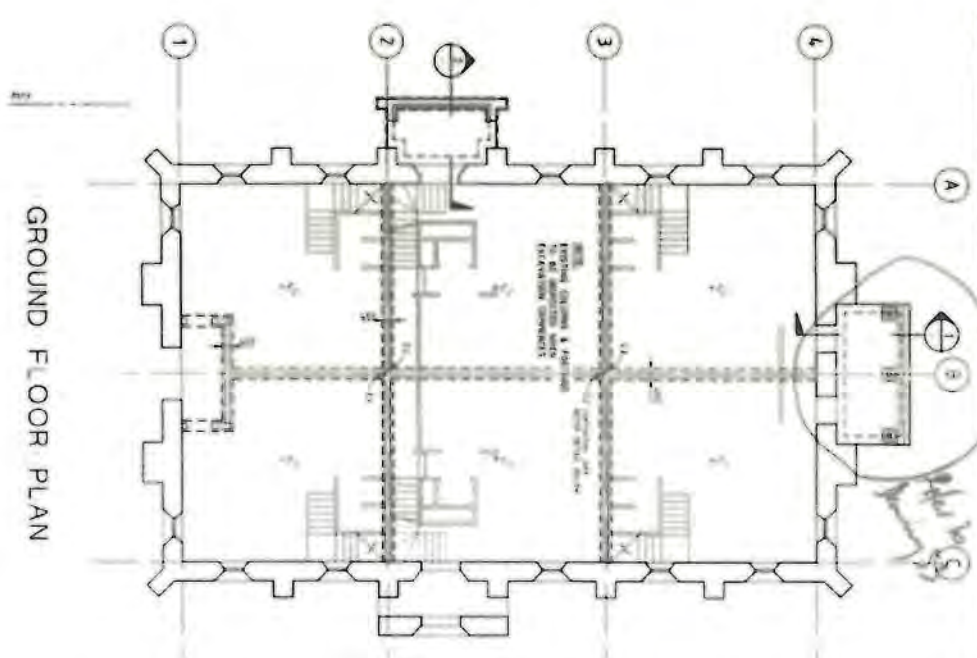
1994 plan ground floor plan showing interior alterations for six apartments
